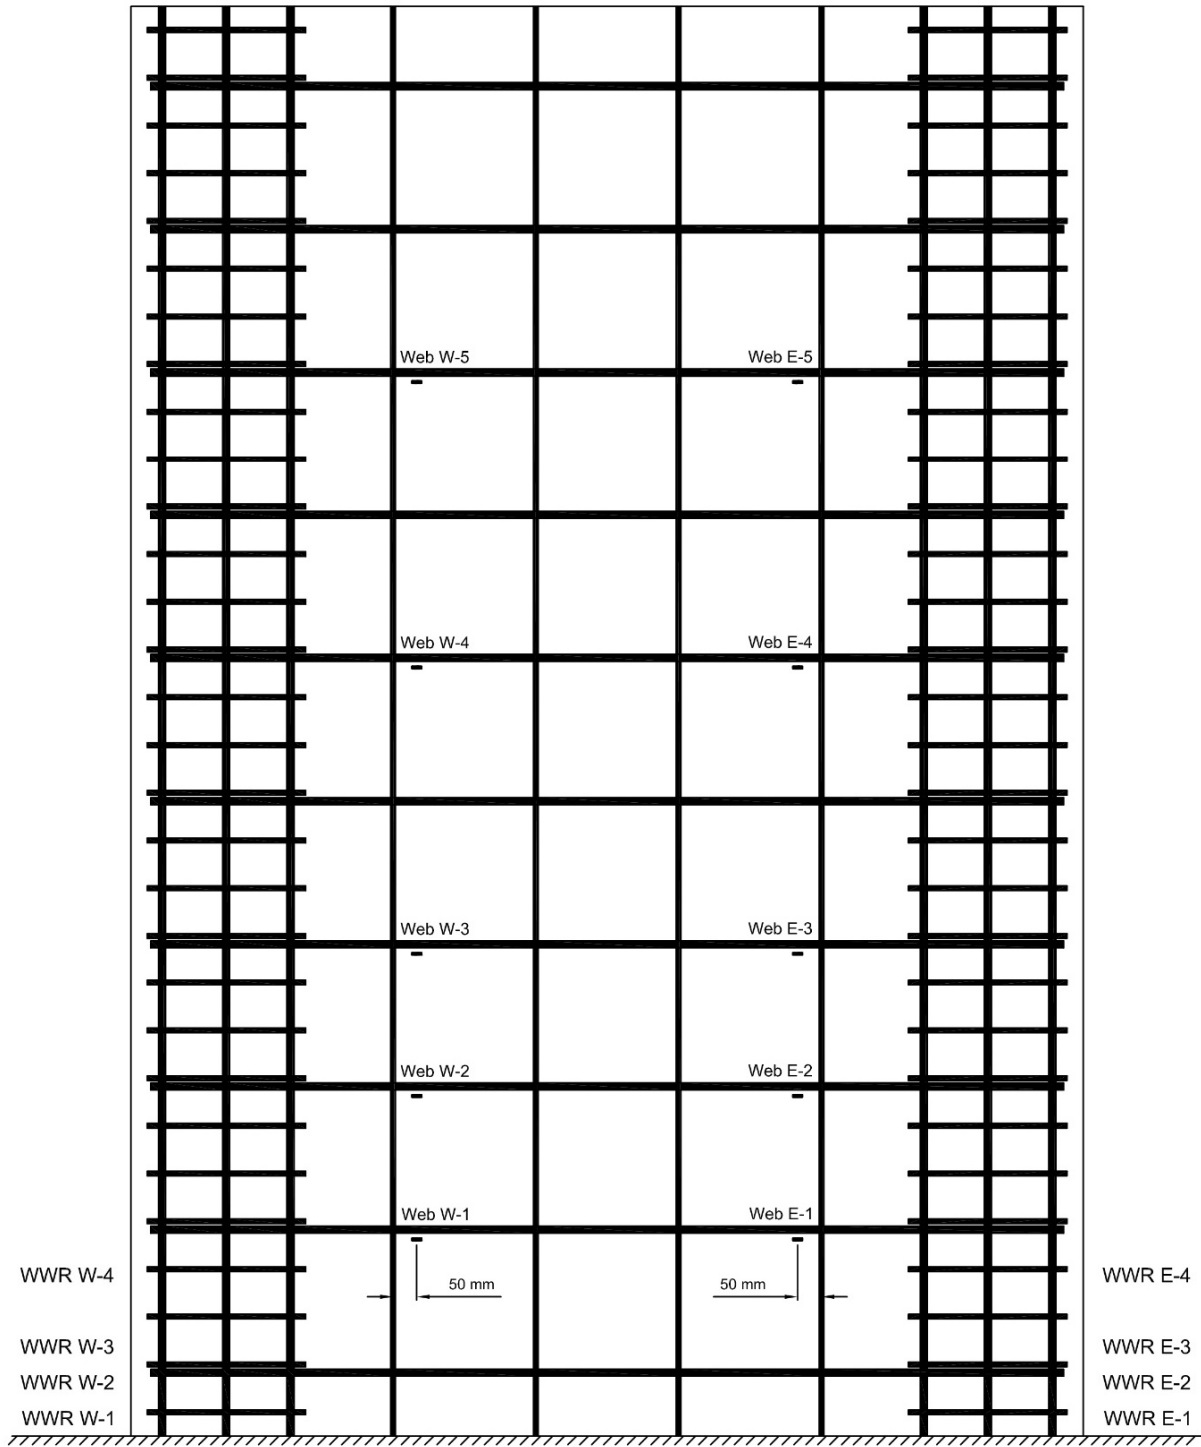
Shear Wall No. 1 – WWR Grids Labels and Web Reinforcement Strain Gauges
